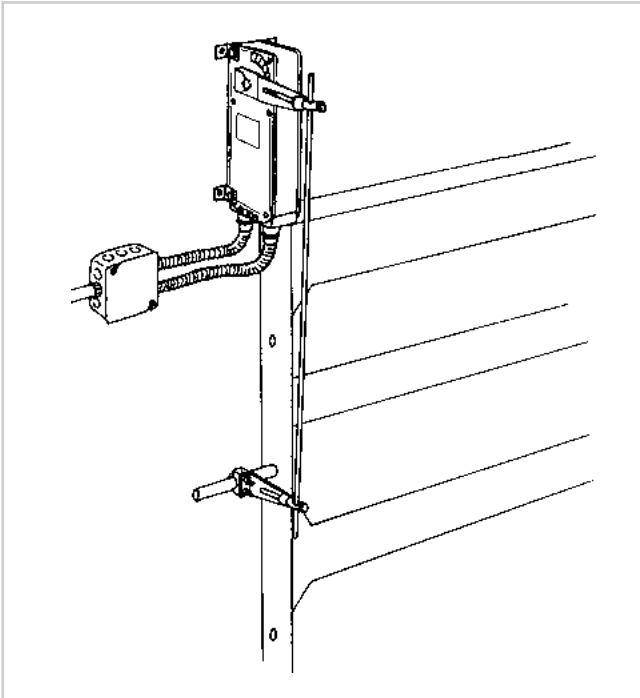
Mounting to the side of the damper with use of the ZG-AFB crank arm kit
